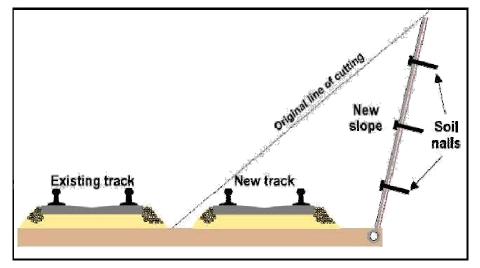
Soil nailing in railway construction for laying of new tracks adjoining to existing ones. (Ref: <u>www.geofabrics.com</u>)
